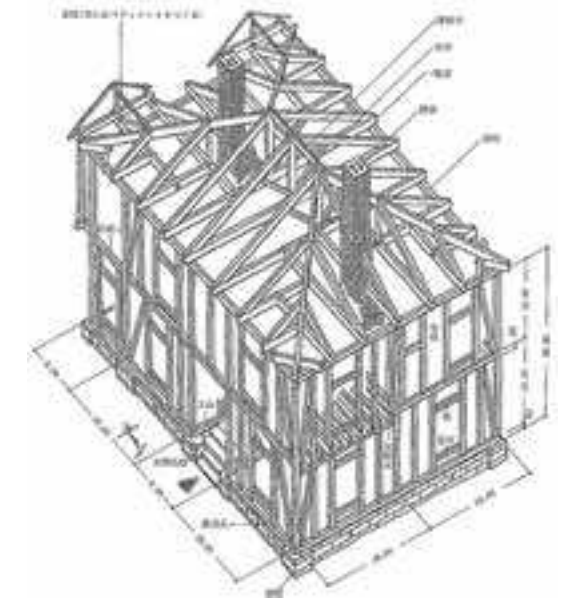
The original wooden-timber structure and chimney, all typical of US east coast non-seismic region, was restored. (credits: K. Masuda & O. Mendoza, 2011, edited from the conservation report 1998)
